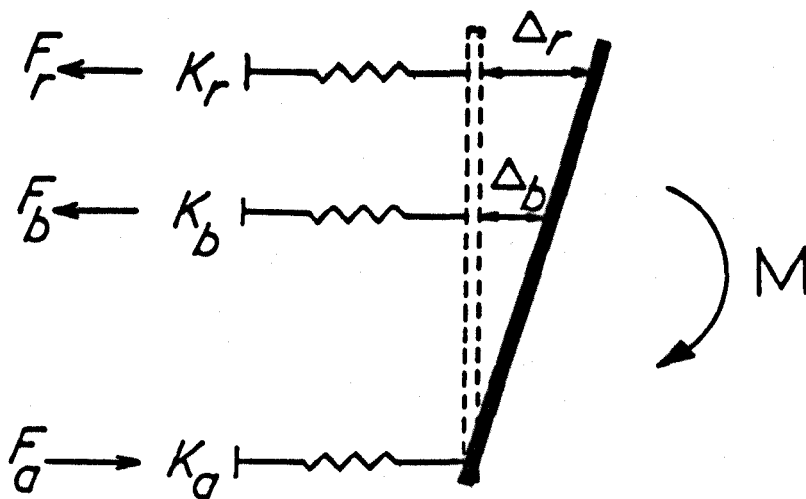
, Simplified model including steelwork connection and reinforcement
